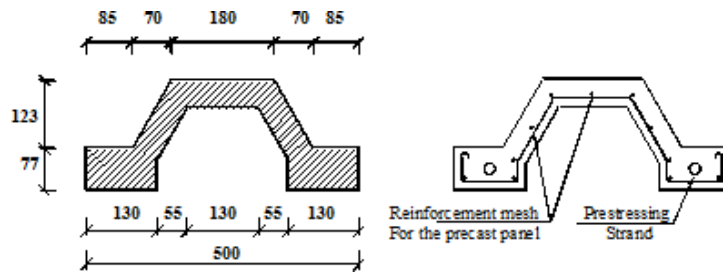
Dimension of slab and reinforcement (all dimensions are in mm)
